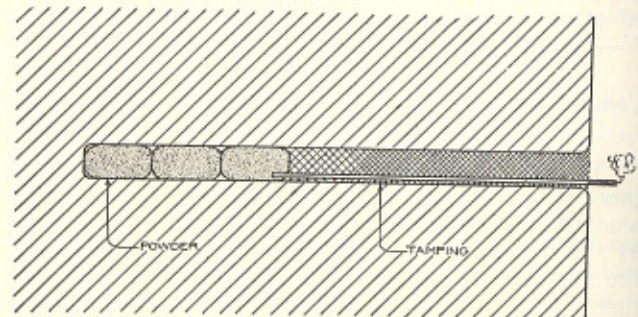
Drill Hole, Showing Blasting Barrel in Place.
